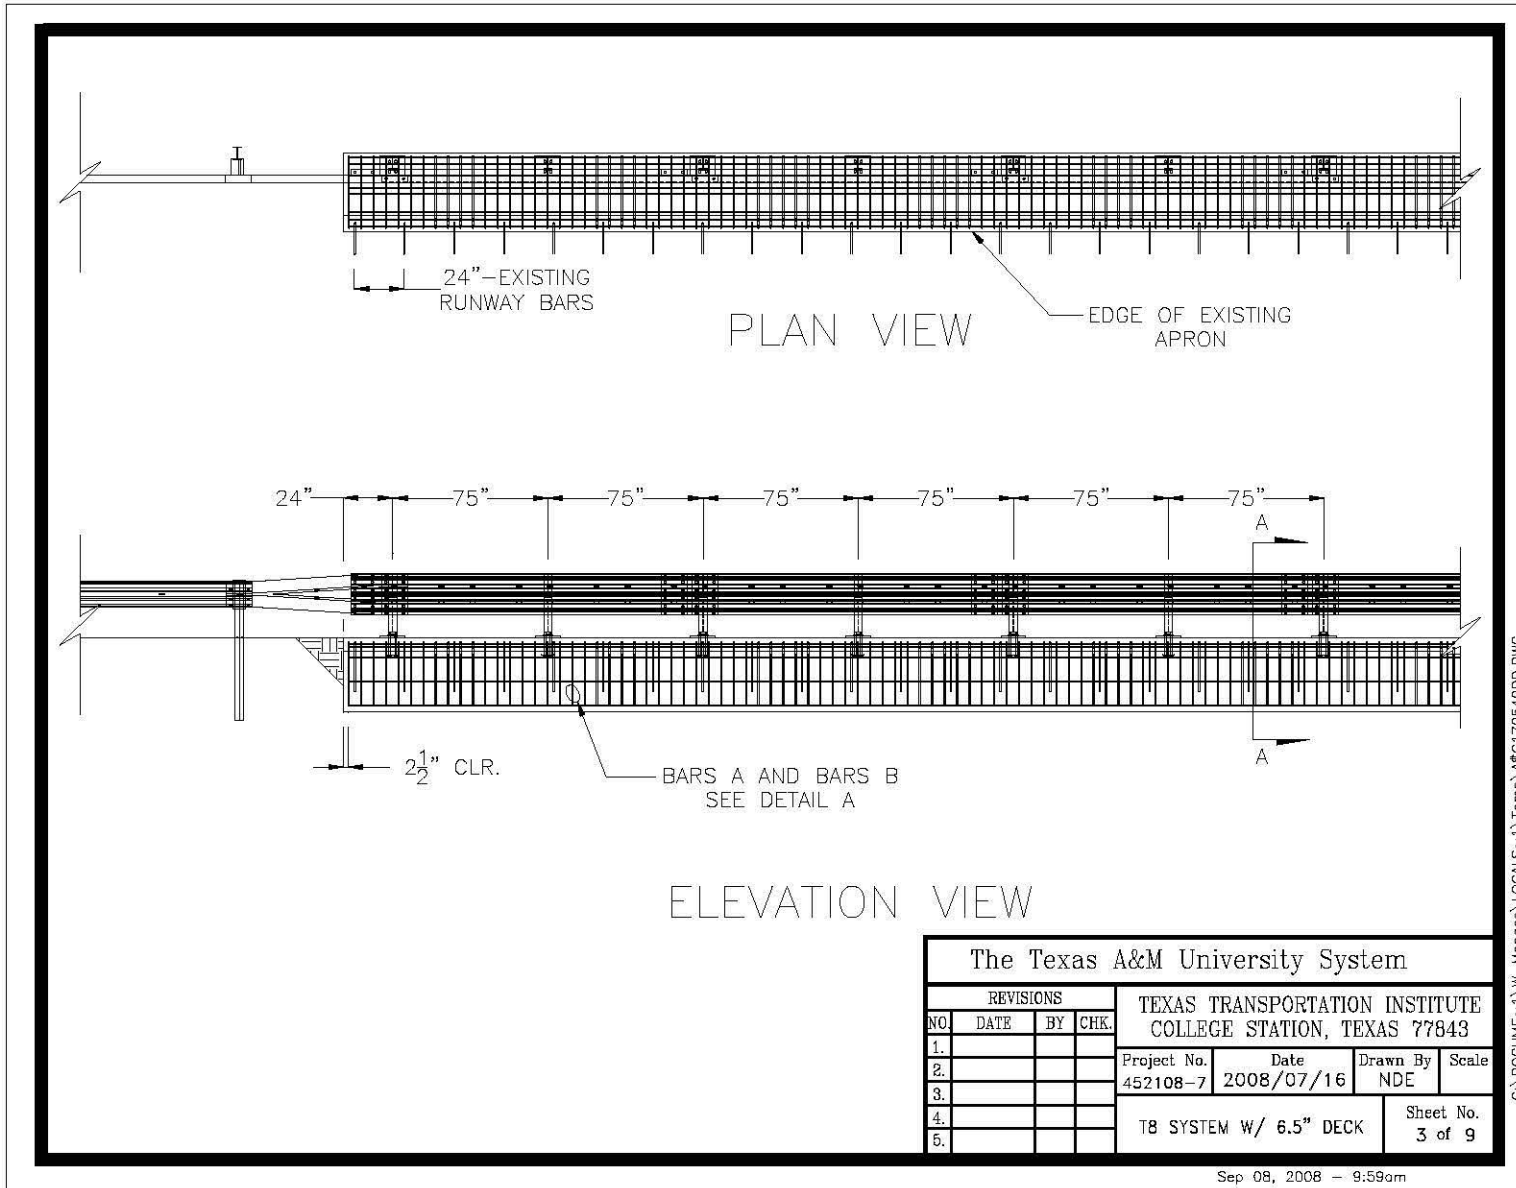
Details of the T8 Bridge Rail Installation – Rebar Detail.
